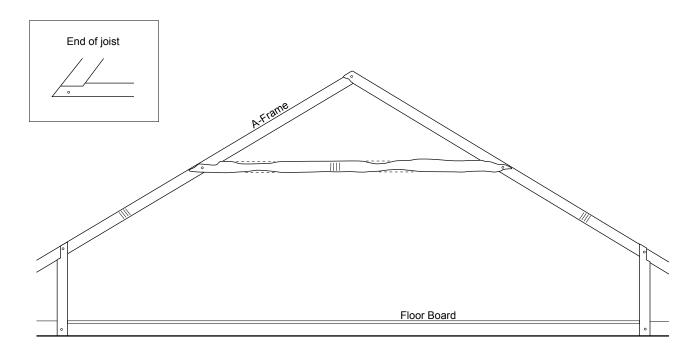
Roof truss No.4 (Fig.9a) in elevation
